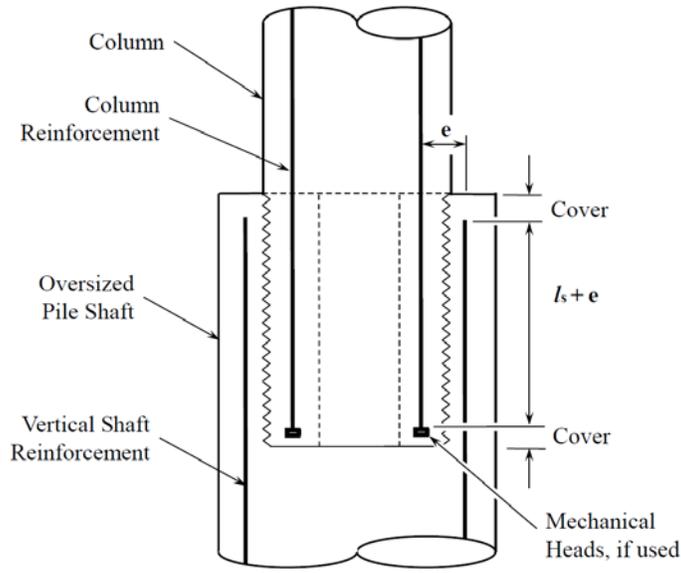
Diagram. Column-to-shaft longitudinal bar arrangement.
